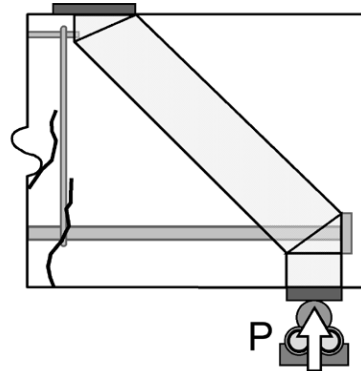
illustrates the pattern of crack widening that was observed in Specimen CCT-08-45-10.39-2. Initially the first crack widened until the formation of the second crack closer to the node. Then widening of the first crack ceased and the second crack grew wider than the first. Eventually a third crack formed even closer to the node. After the formation of the third crack, the widening of the second crack halted and the third crack widened to an even greater extent. For every unconfined specimen tested, the crack closest to the node always demonstrated the greatest crack widths and the most rapid growth of crack width.
